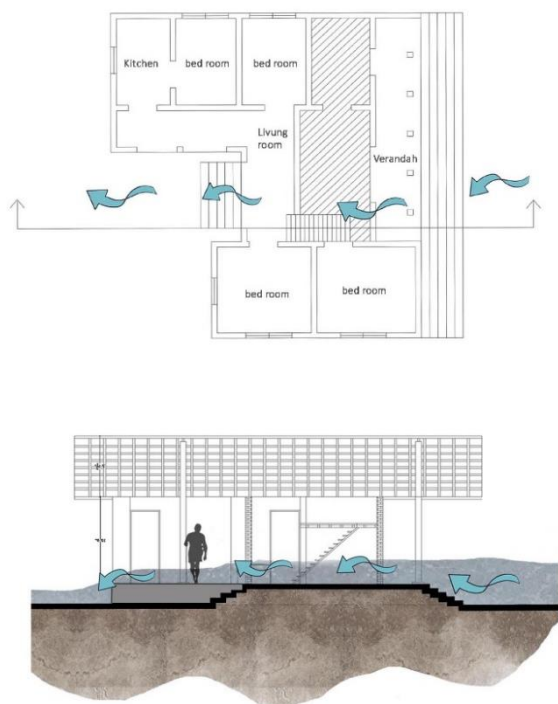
Floor Plan and Cross Section showing movement of flood water and level of inundation in Case 1 (Source: Henarangoda, 2020)
